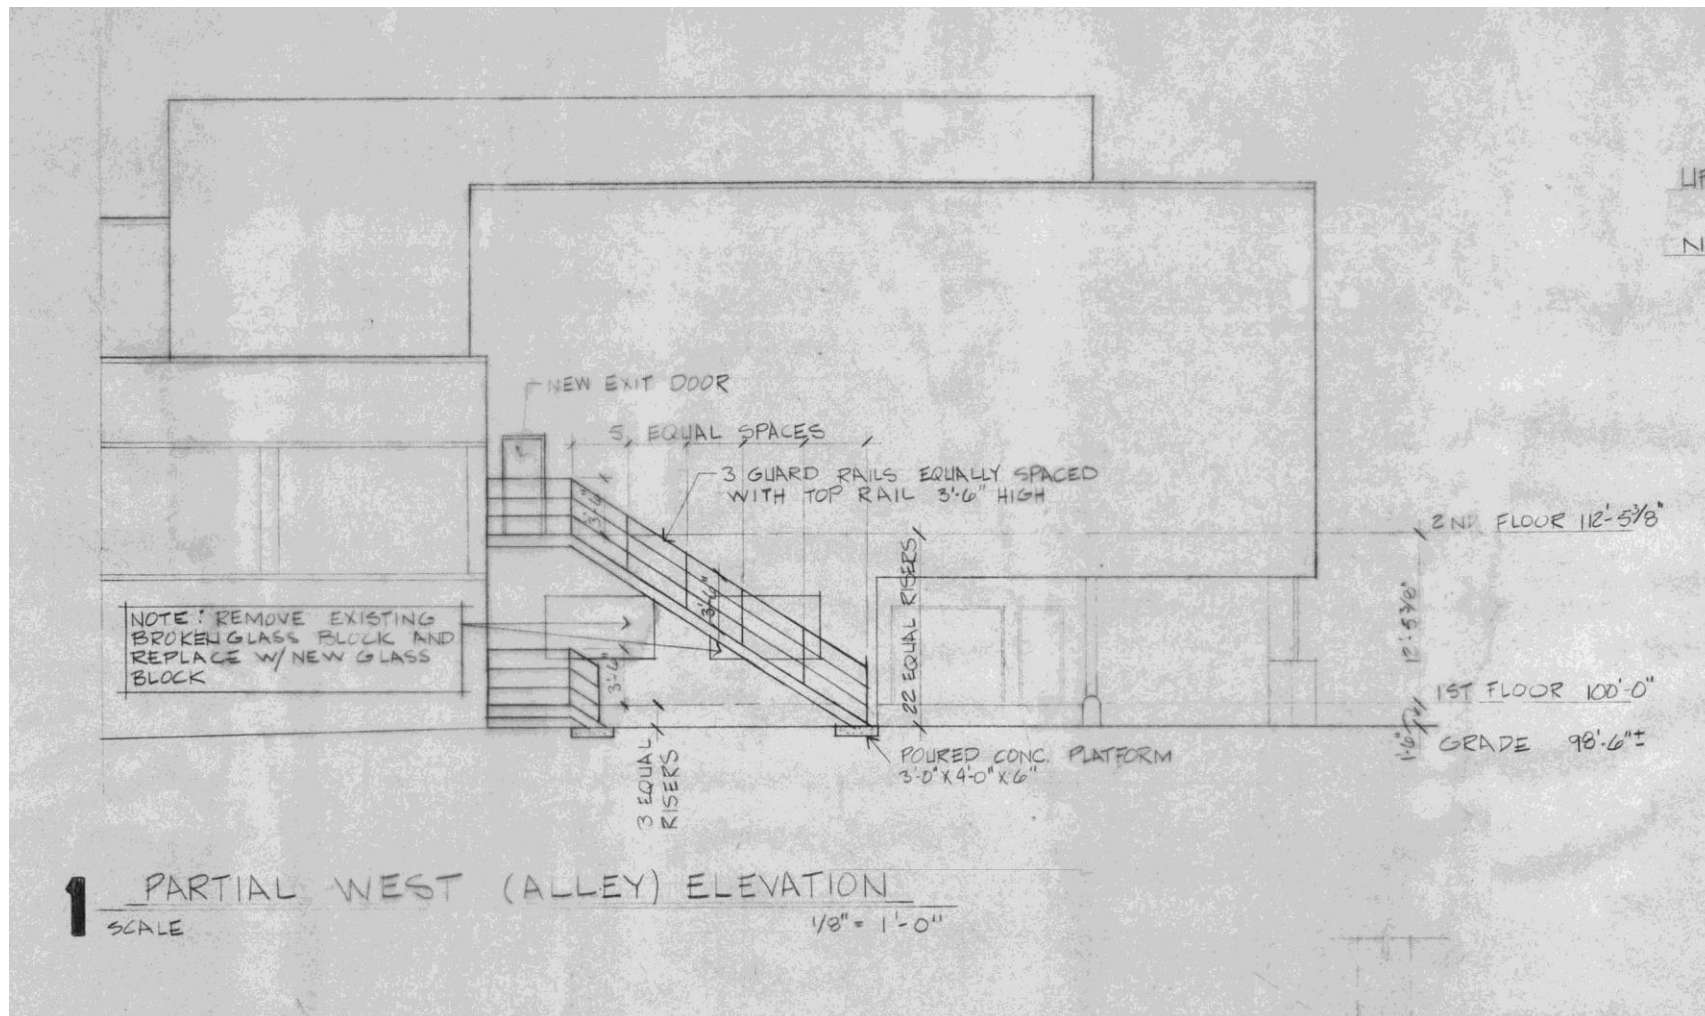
Fire Escape details, Springfield YMCA Renovation (Maslauski, Litvan and Berstein 1975; Sheet No. A5).
